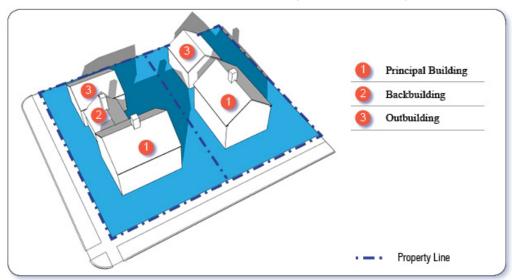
A42.10 PRINCIPAL BUILDING/BACKBUILDING/OUTBUILDING
